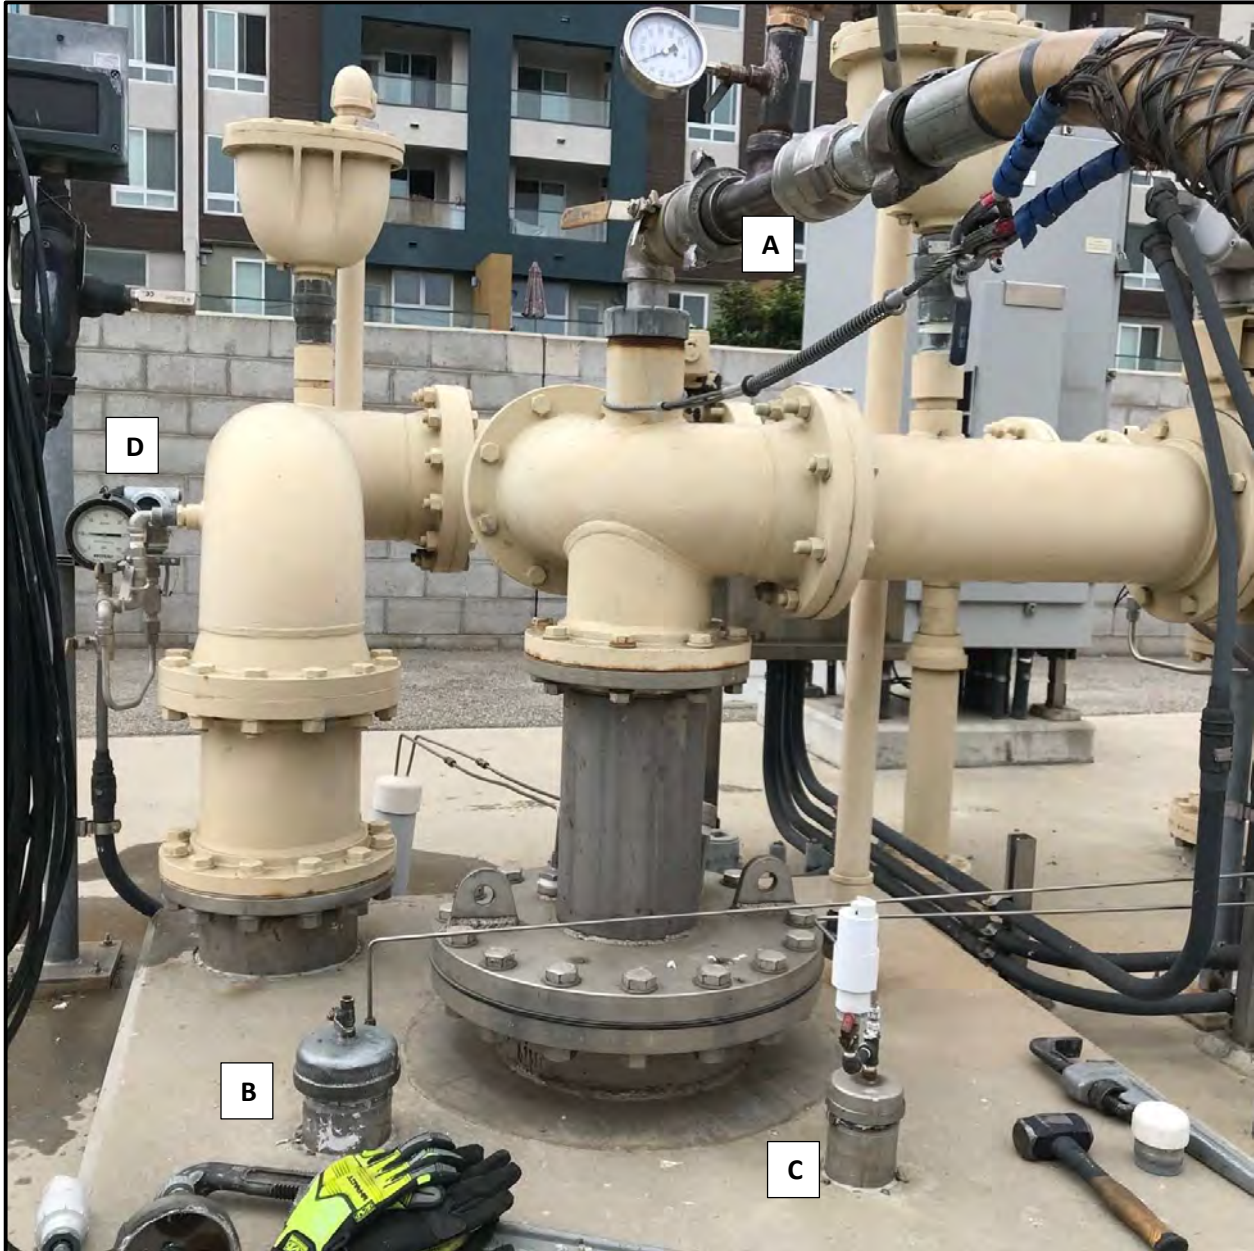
Figure VII Image of injection well I-32H being prepared for air-lift backwashing. A. airhead attached to dedicated 2-inch air-line and secured using safety retention cable. The airhead muffler (used to suppress sound during venting) is out of view. B. 3-inch camera tube (4-inch above ground) with water level transducer removed and neatly spooled (along the left margin of image), cap secured, 1/4-inch bleeder tubing removed and valve closed. C. Gravel feed tube, ¼-inch bleeder valve and ¼-inch valve below the 1-inch plastic air valve should be closed prior to backwashing. D. Flange pressure sensor PIT 3425, close ¼-inch valve below sensor prior to backwashing.
